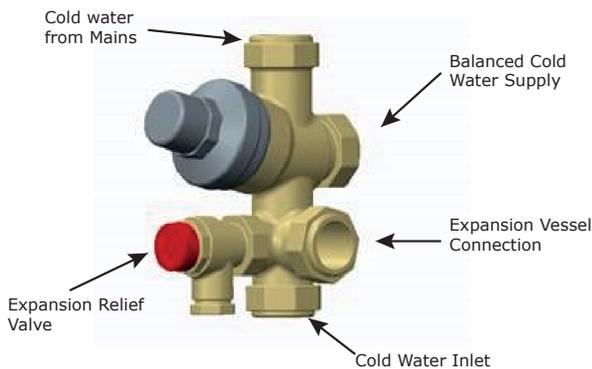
Detail showing the connection of the expansion vessel to the inlet group
